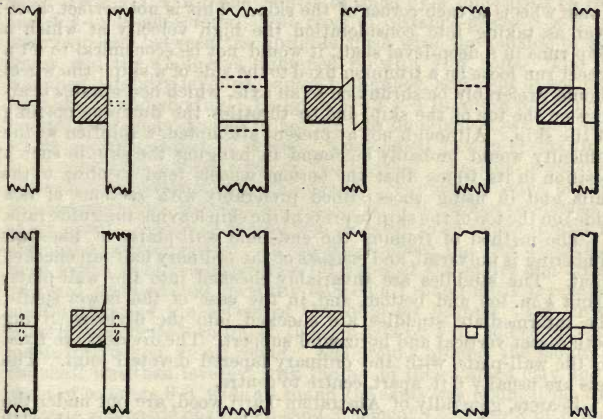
JOINTS USED FOR WOODEN GUIDES.
